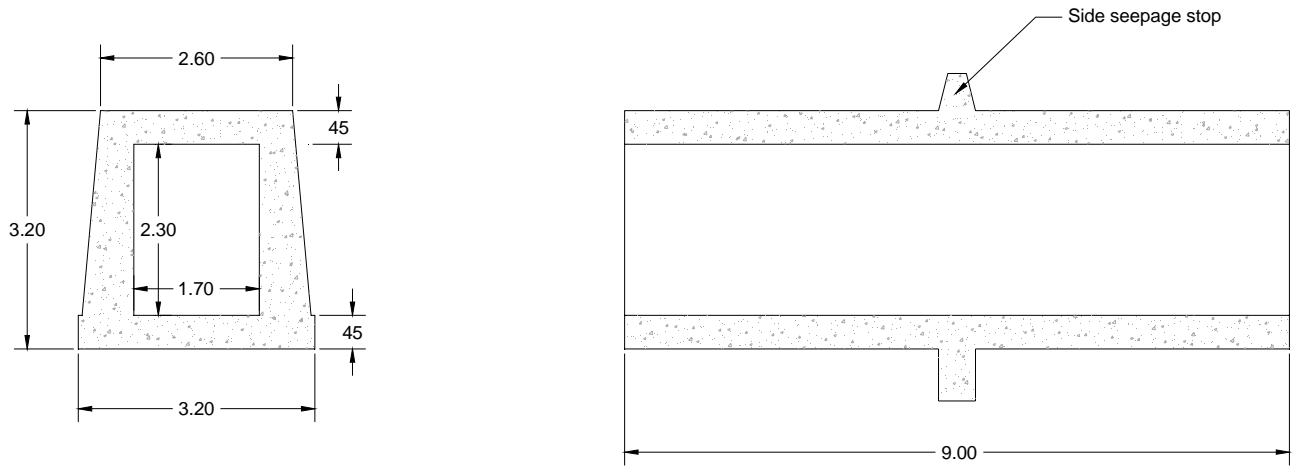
Cross and longitudinal section by bottom discharge (steel concrete)
